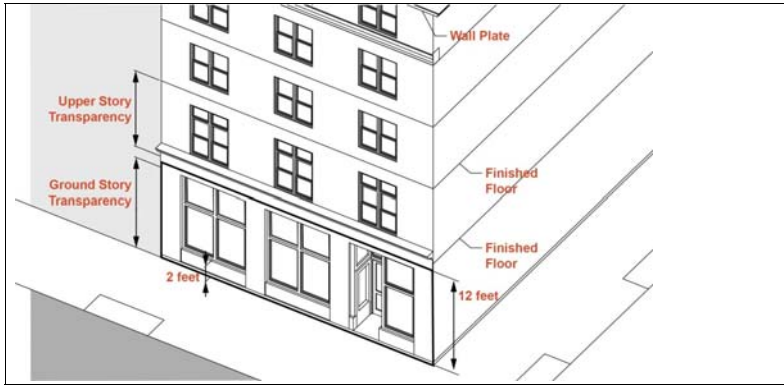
B23.10 - Ground Floor and Upper Floor Façade Glazing
